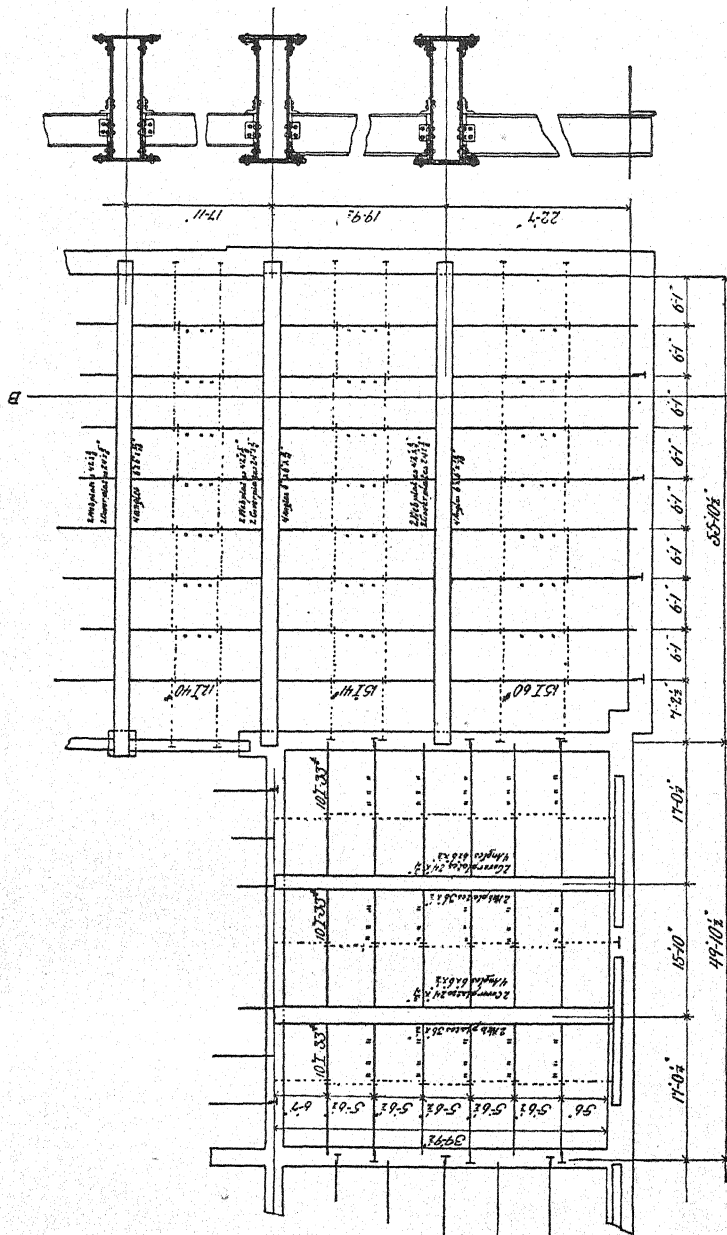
Chicago Public Library. Steel construction between the floors.
